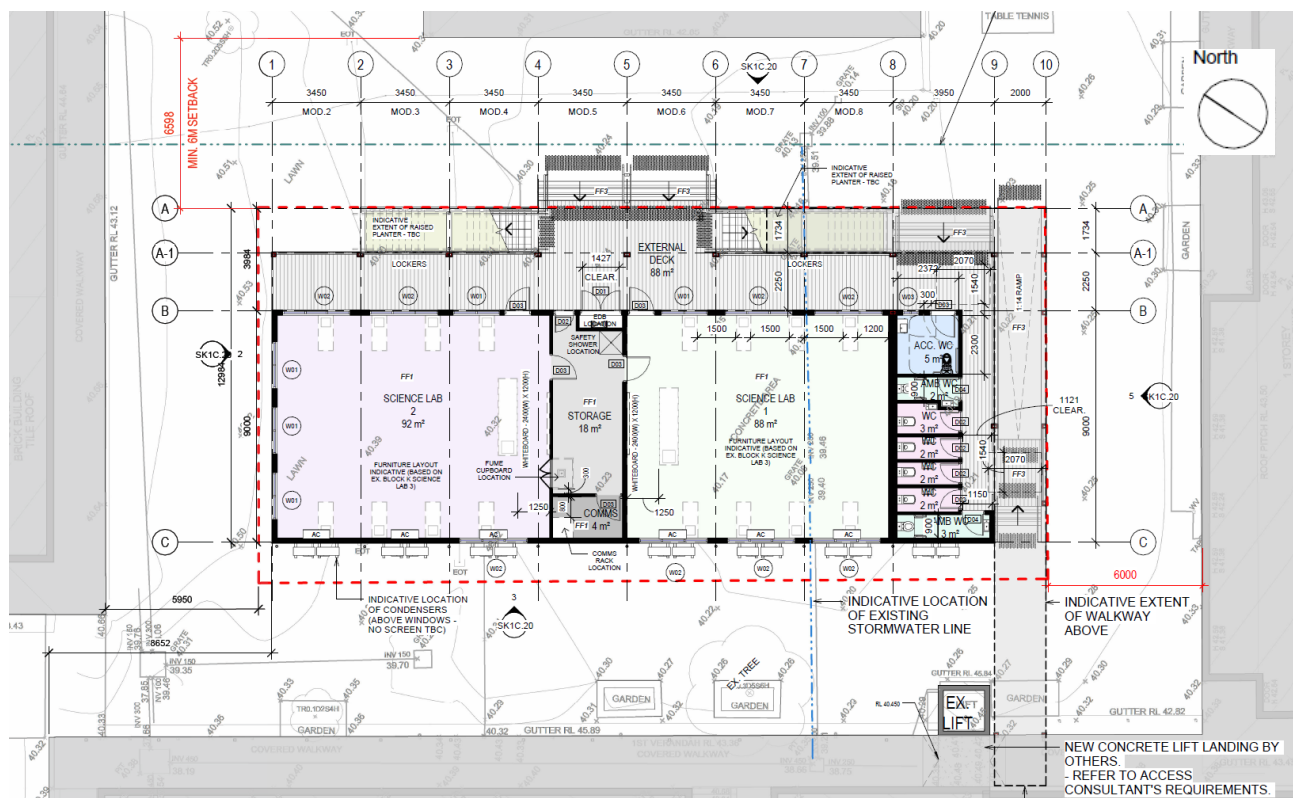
Proposed ground floor plan (Source: Marathon Modular)
